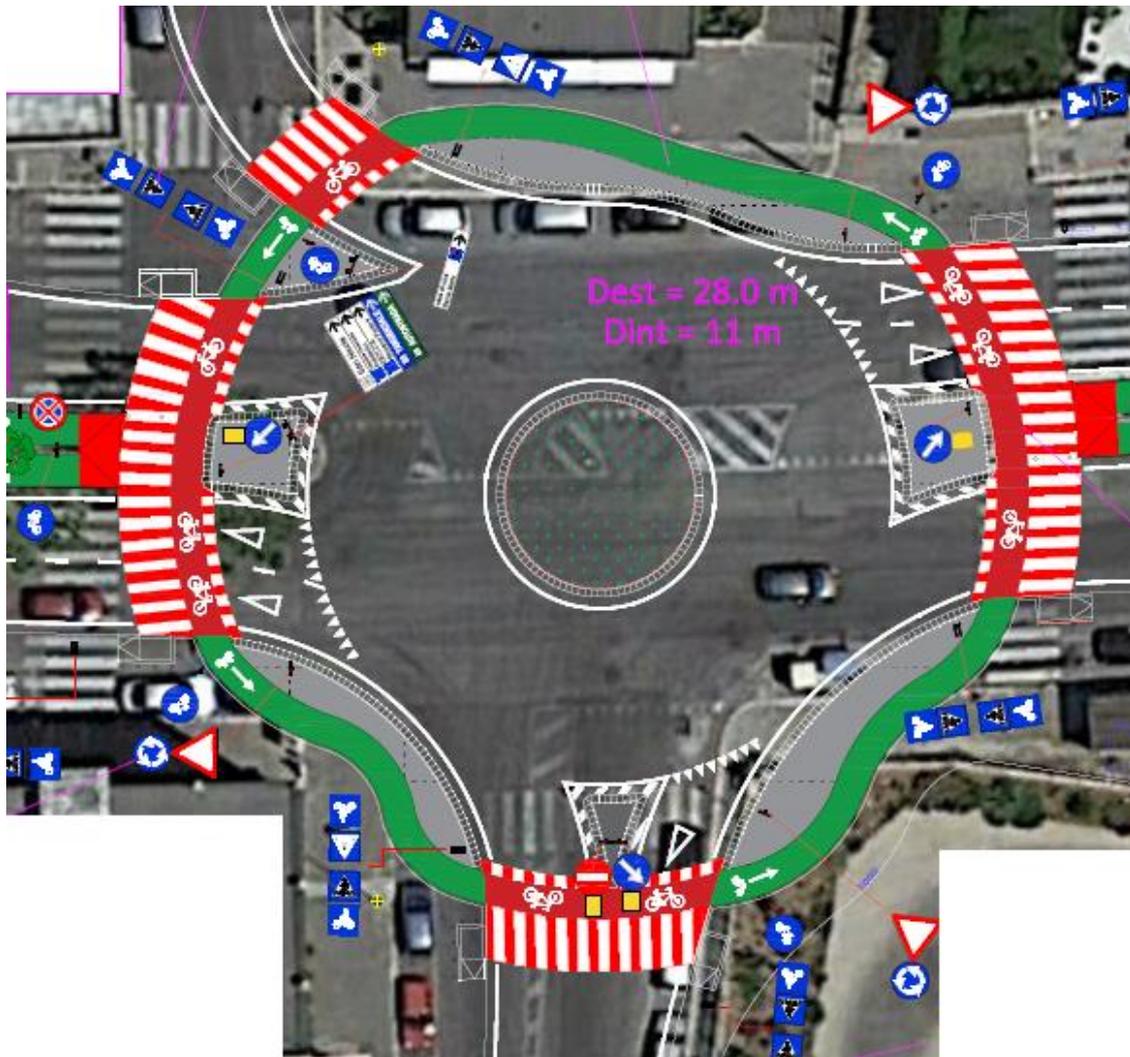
Long-Term countermeasures - Intersection IV.
